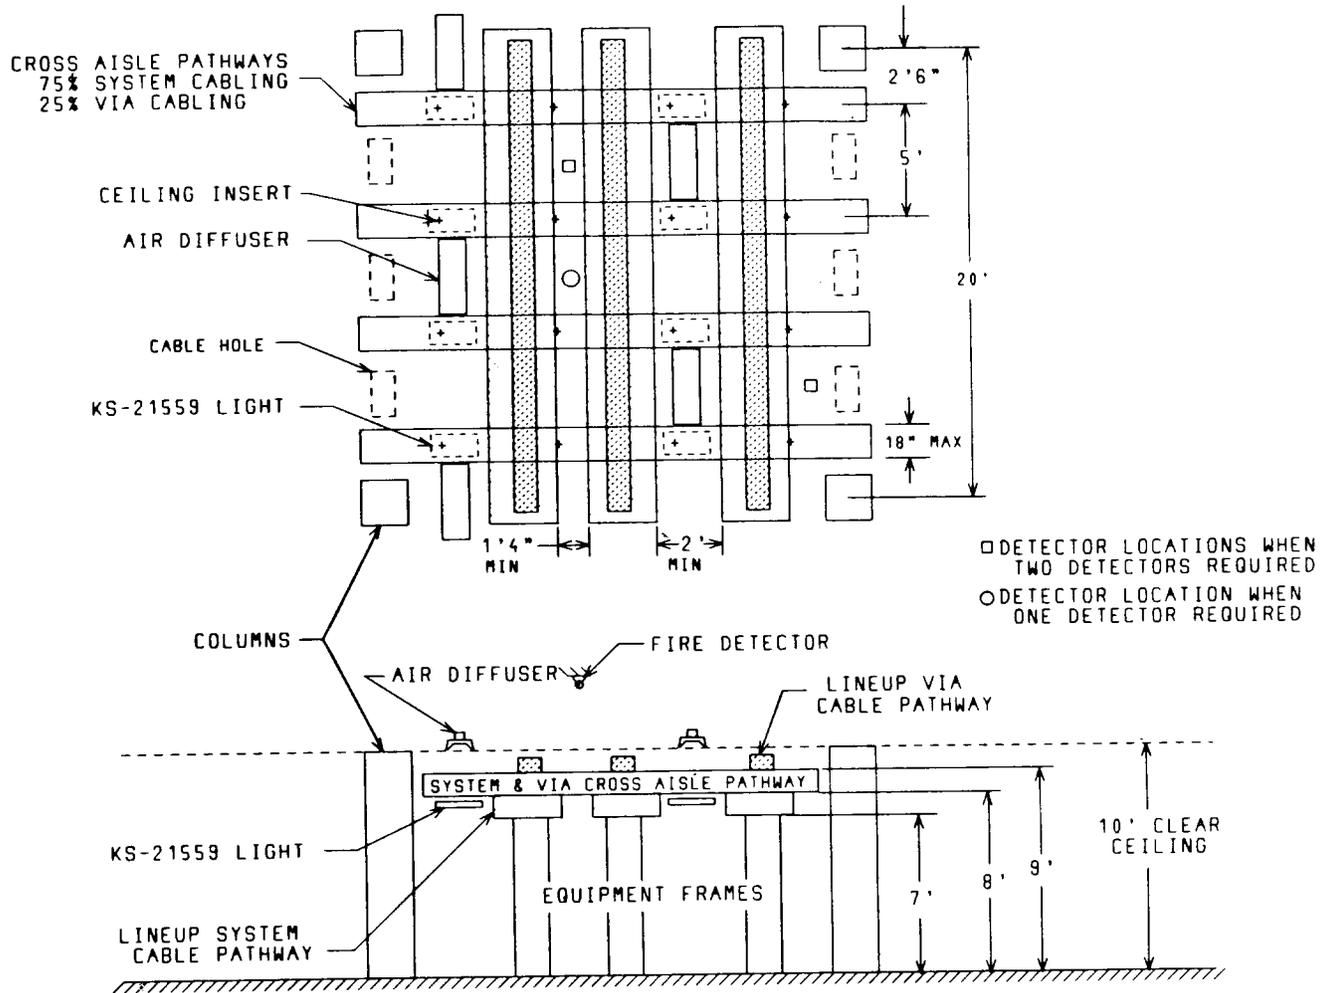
Cable Pathways Plan for 18-Inch Deep Frame Areas
